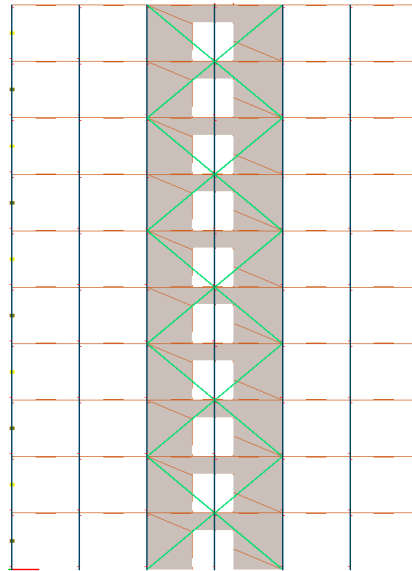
FE model of the 10 storey column building with added cross bracing.
